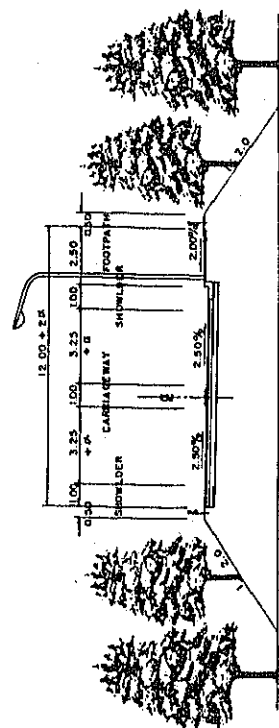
TYPICAL CROSS SECTION FOR 55 AND 45 m
